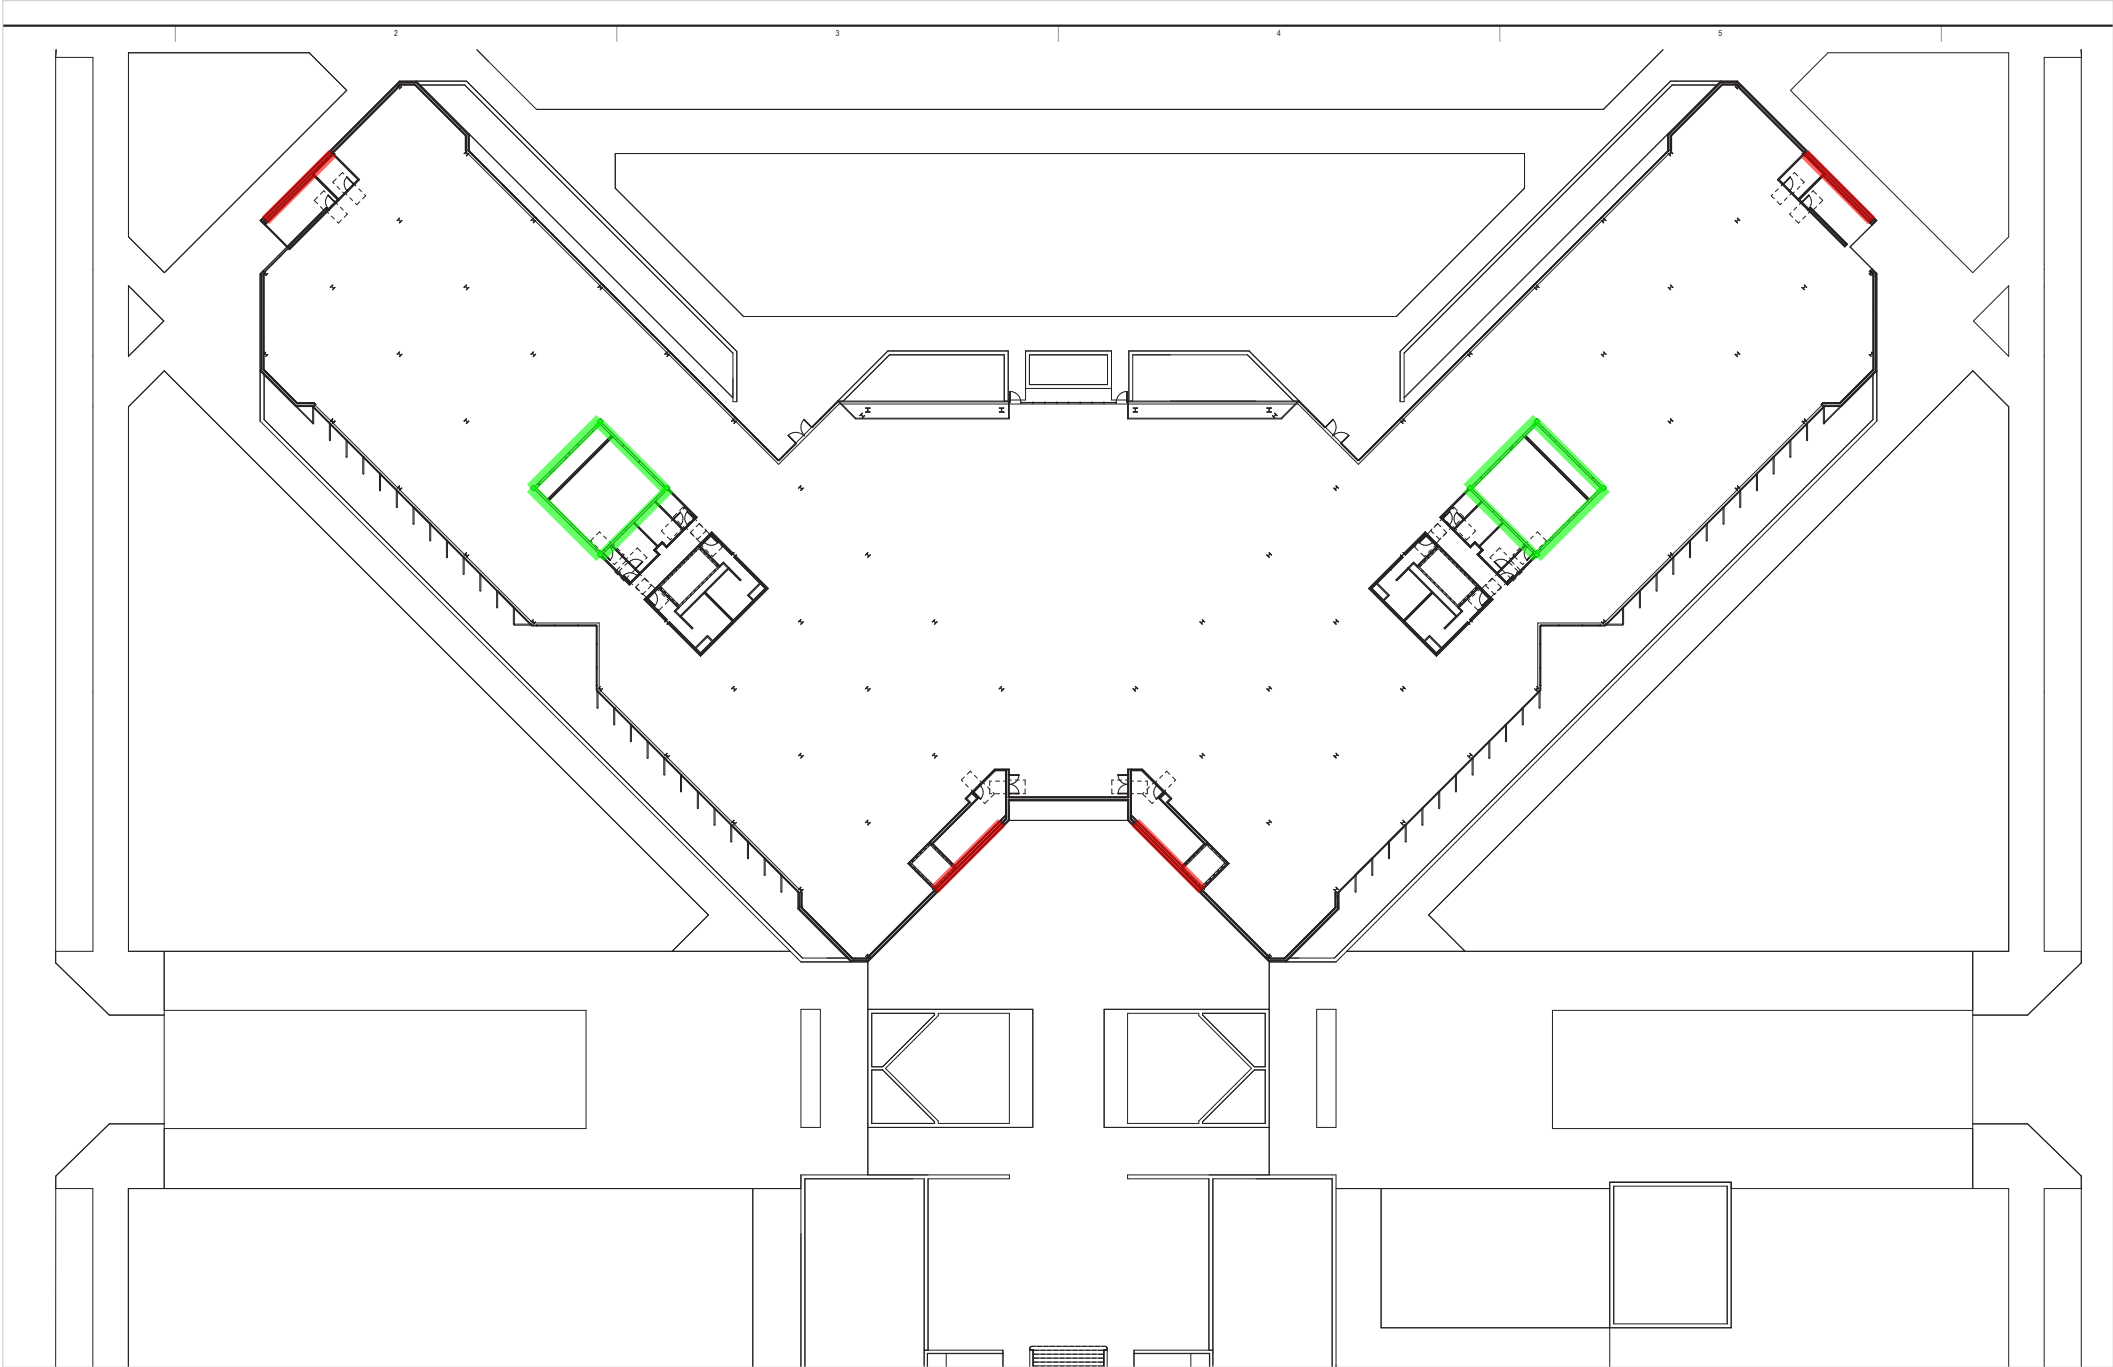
Existing building lateral system elements at first floor and above. Green indicates concrete shear walls, red indicates steel braced frames.
